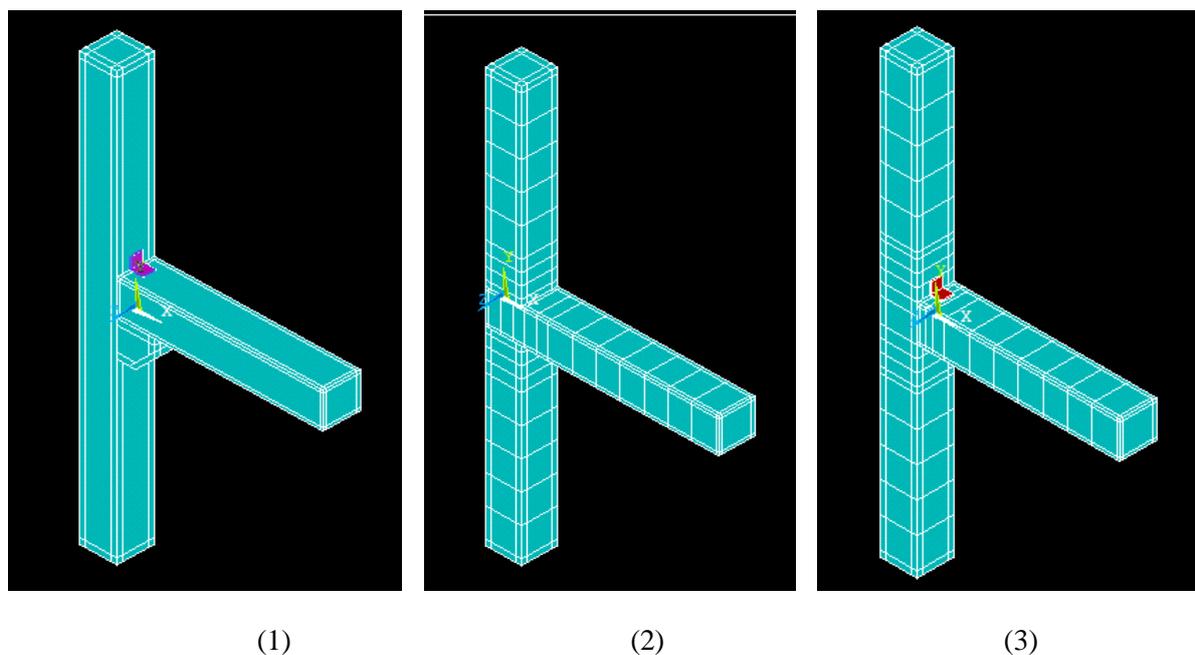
ANSYS model of precast beam and column connection with corbel (S1). Figure 2: ANSYS model of precast beam and column connection with beam-column visible connection (S2). Figure 3: ANSYS model of precast beam and column connection hidden connection (S3).
